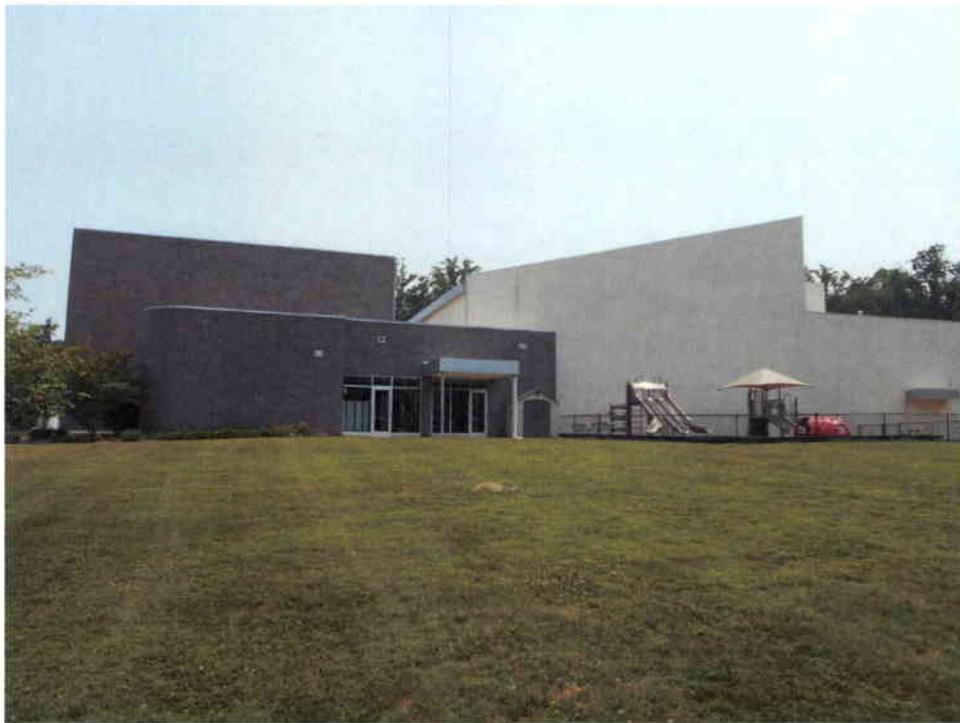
Looking northeast at side building entrance and playground (6/10/15)
